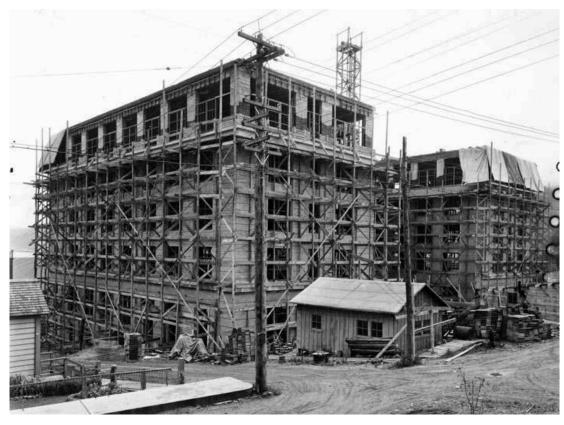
Masonry Exterior Walls Under Construction, Using Wood Scaffolding, 1930
